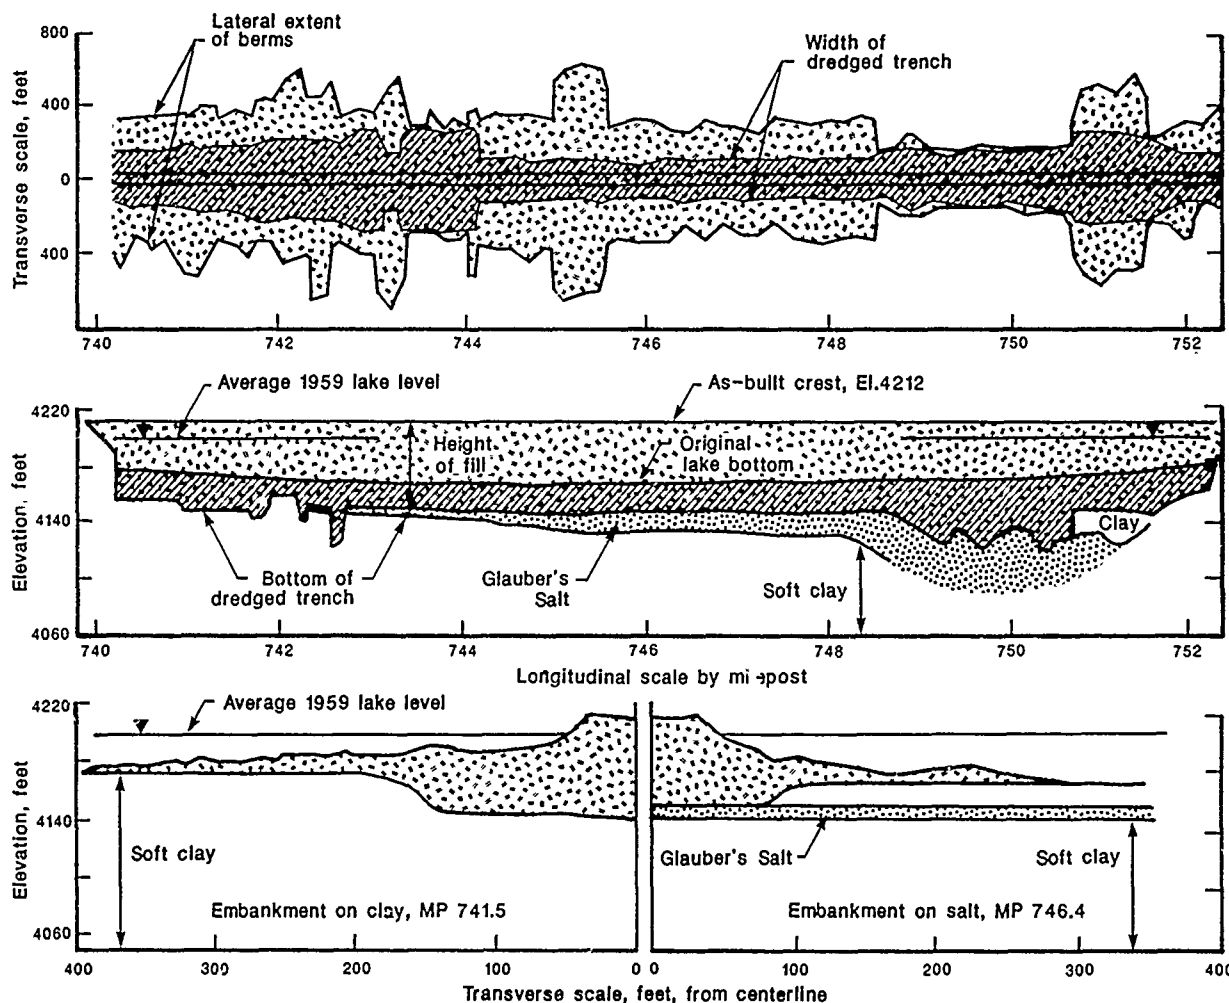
Plan, Profile, and Typical Cross-Sections of Causeway.
